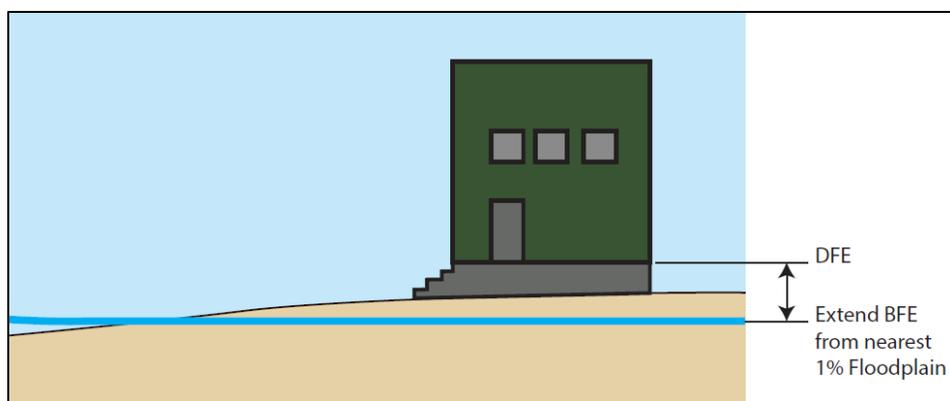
This schematic demonstrates how to determine the design flood elevation outside of a facility outside of the current 1% floodplain.
